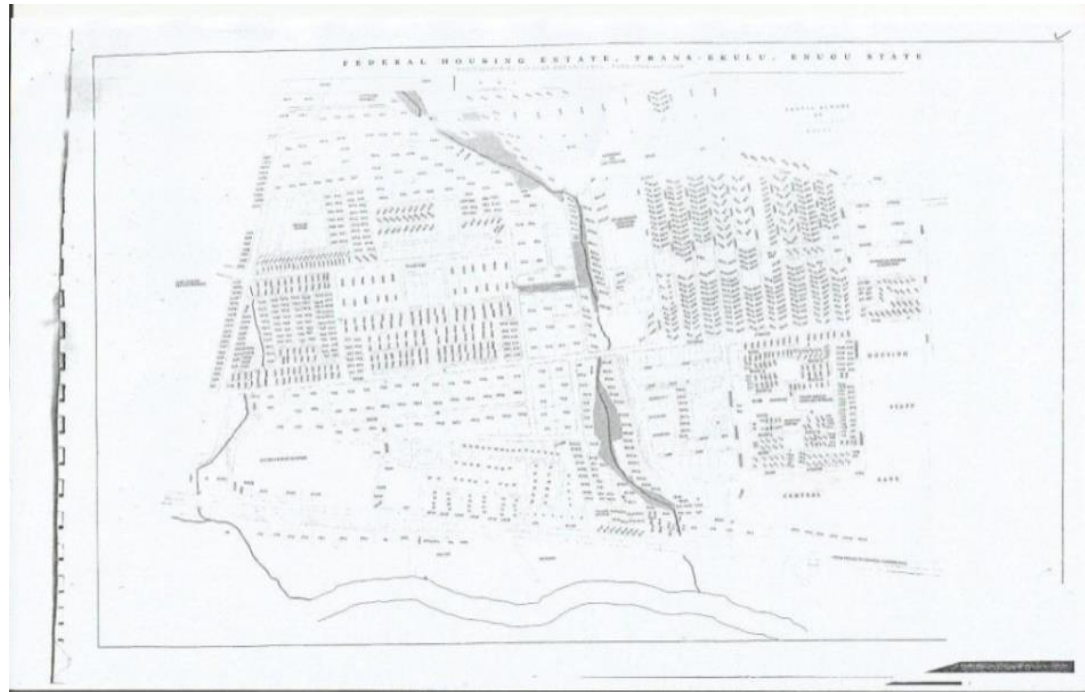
Layout Plan of Federal Housing Estate, Trans Ekulu
